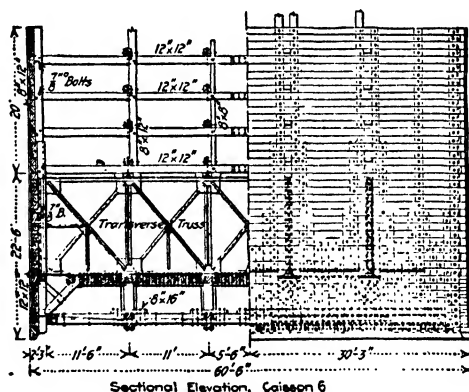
Pneumatic Caisson for Metropolis Bridge, Metropolis, Ill.
